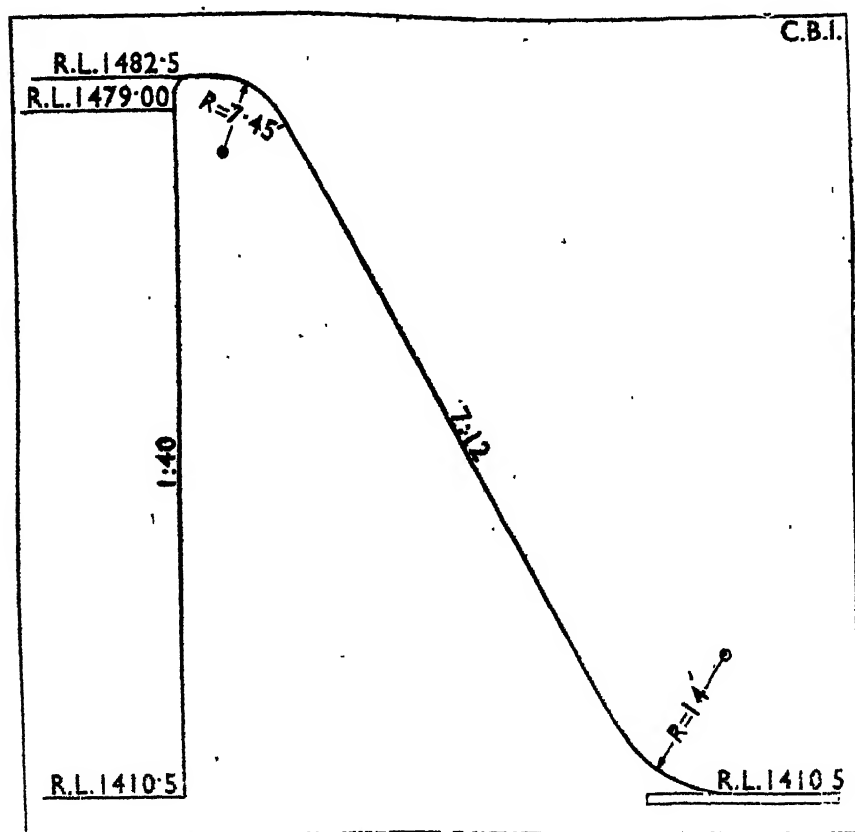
C.12 : Showing profile of Manair spillway as approved for construction.
